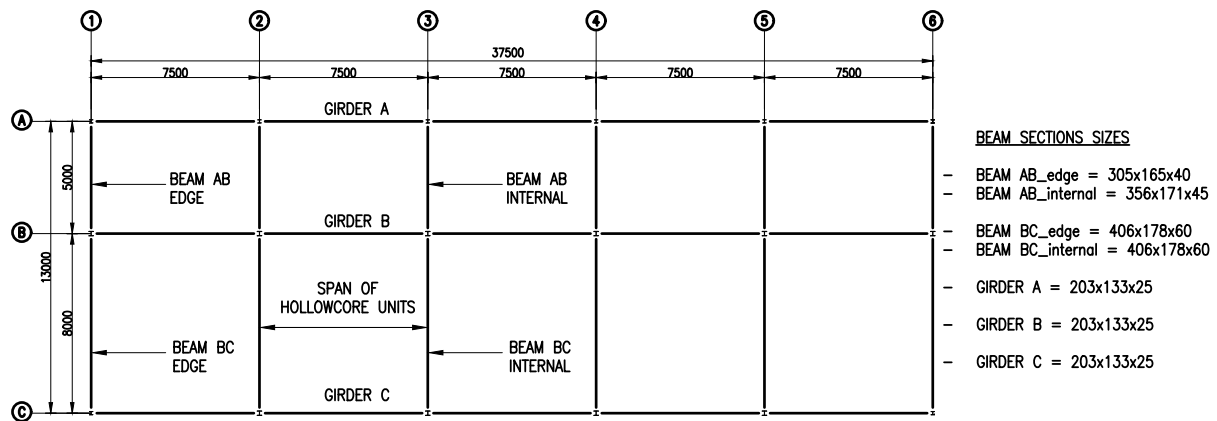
Short span floor layout in steel building supporting hollowcore units
